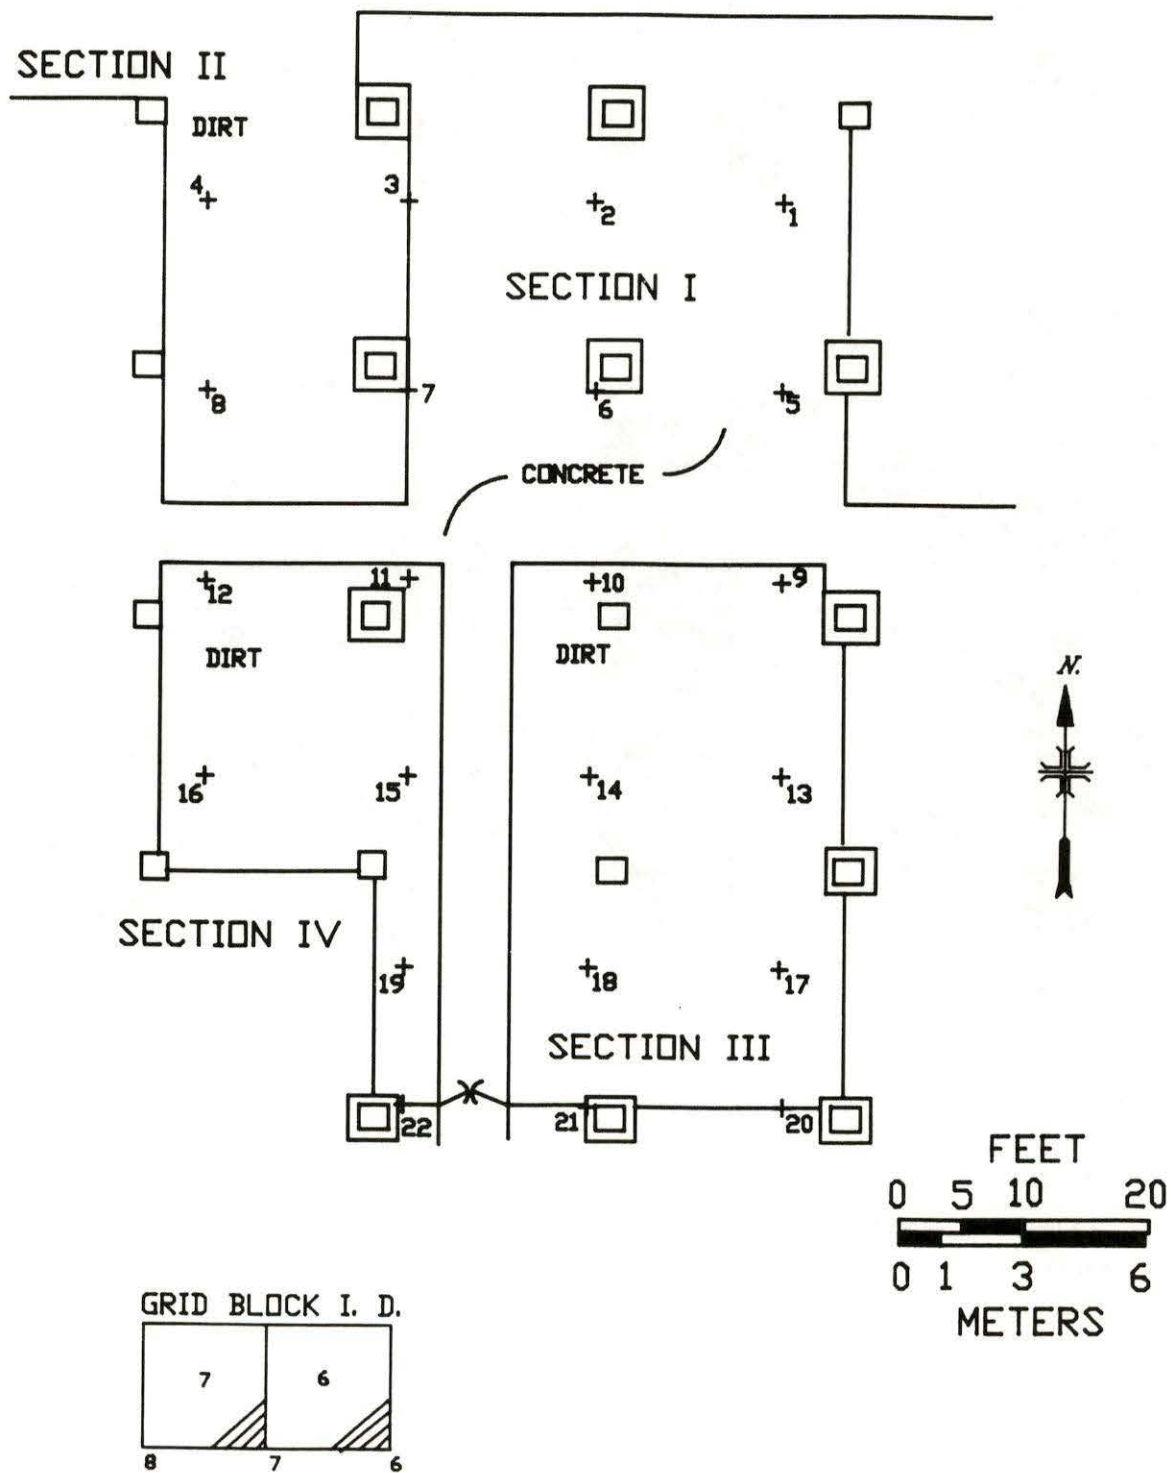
Scaled drawing of the grid system used in the indoor survey of the east end basement of Building 9204-1.
